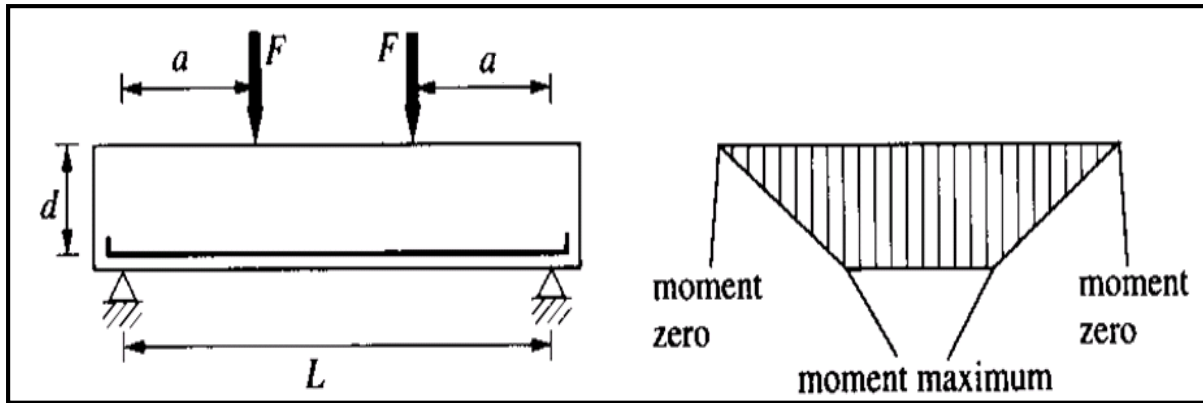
Typical test arrangement and bending moment diagram for member without shear reinforcement (O'Brien & Dixon, 1995)
